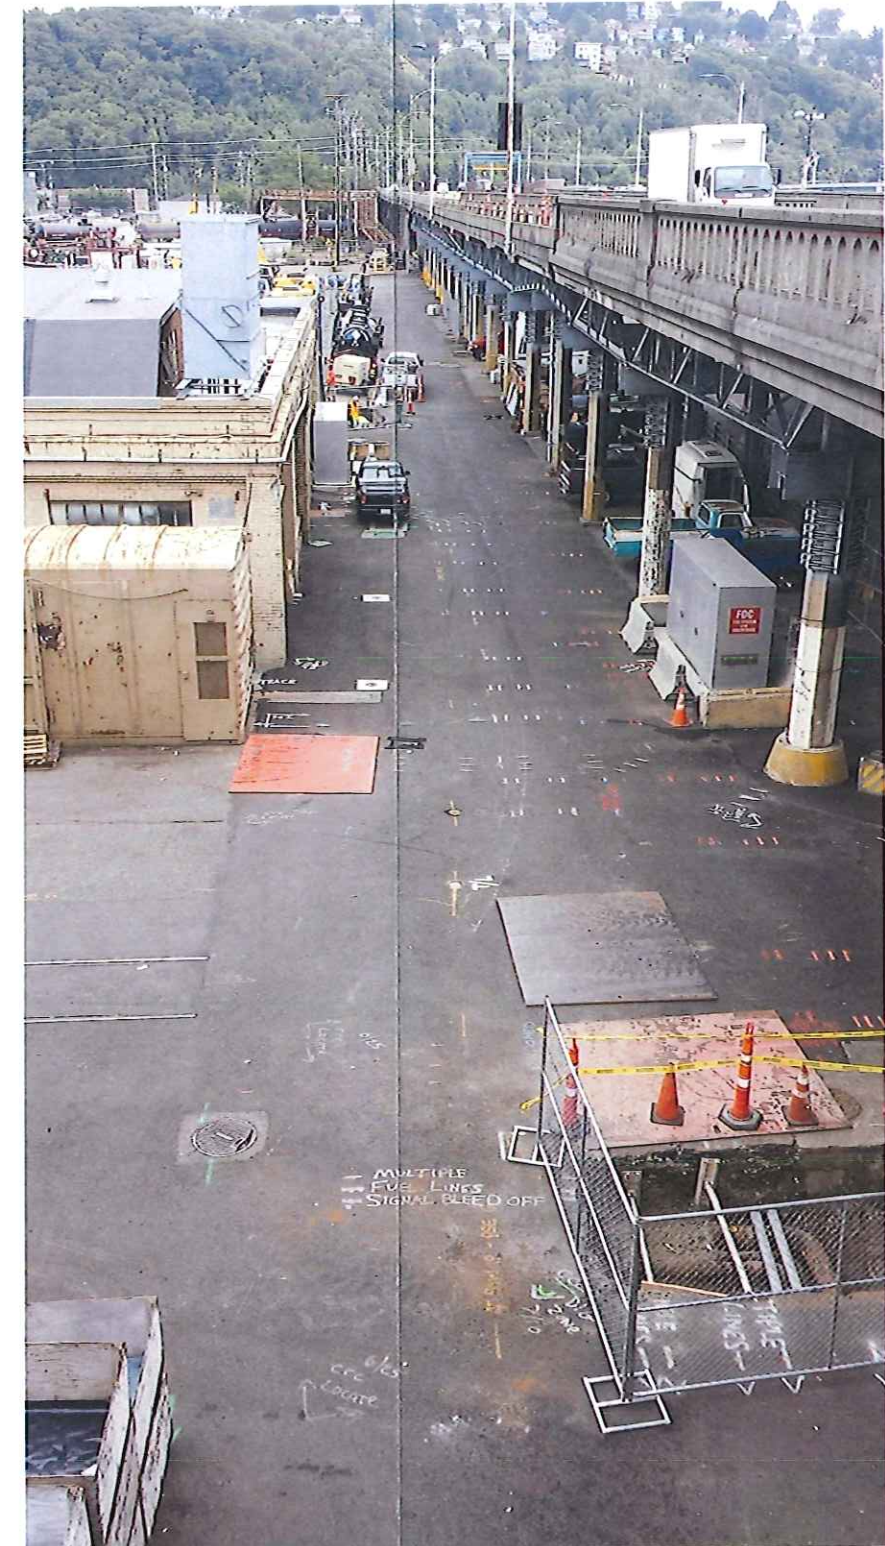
LOOKING EAST ALONG GARFIELD ST. FROM BUILDING W-39
